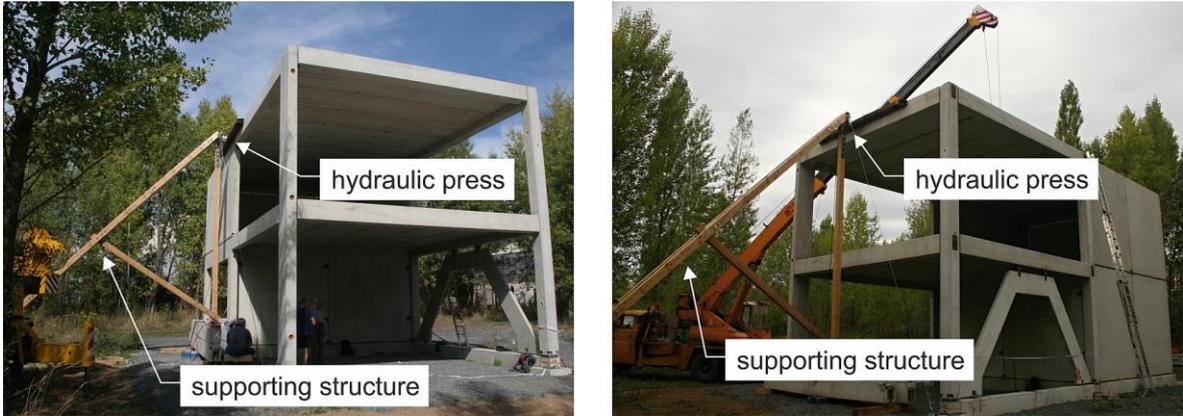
Horizontal static loading in transverse (left) and longitudinal direction (right)
